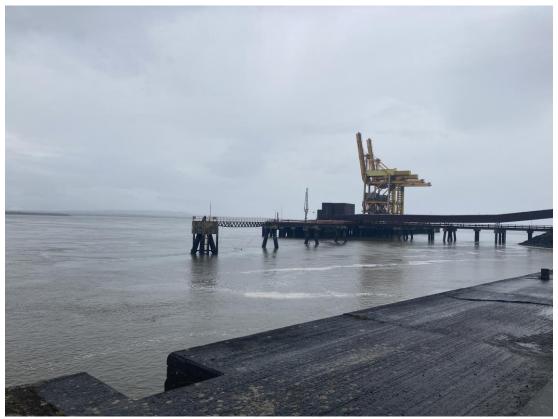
Existing bulk coal unloading jetty and link bridge ashore (BMcD 11/04/2024).
